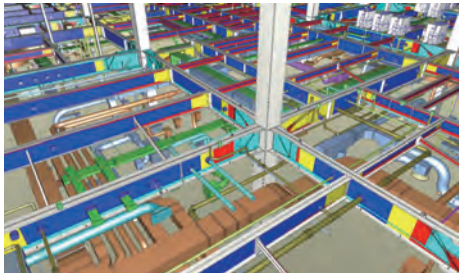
Fixing of ceiling inside equipment and coordination of steel-frame sleeves
